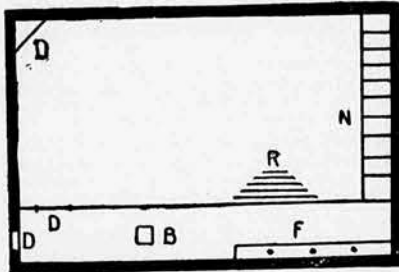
GROUND PLAN OF POULTRY HOUSE.
